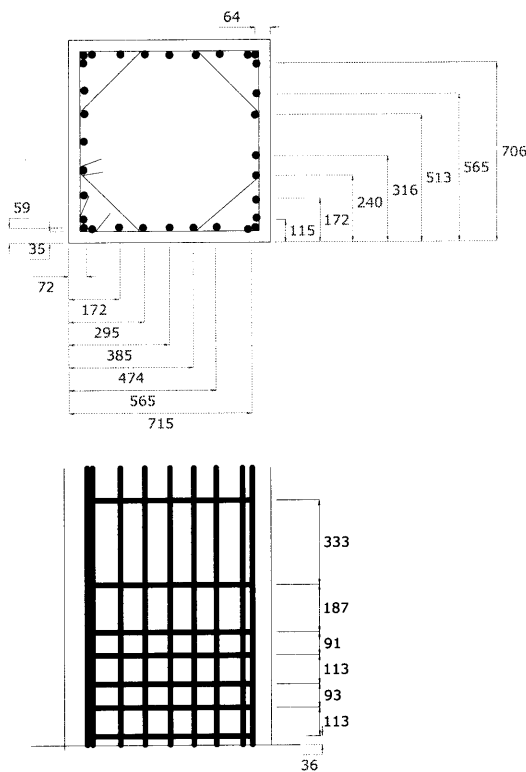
(b) Marking of column reinforcement at the ground floor of New Academic Building (under construction).
